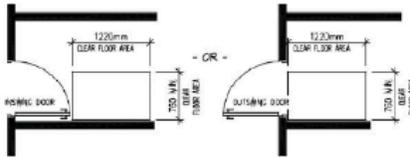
CLEAR FLOOR AREA BEYOND SWING OF DOOR
